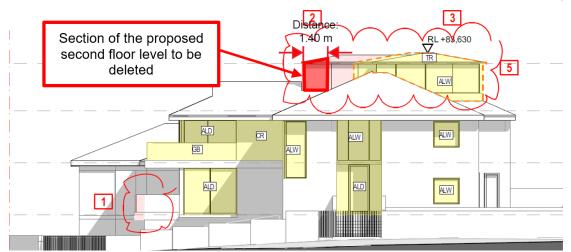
South-east elevation showing the area of the second storey level which is to be deleted
